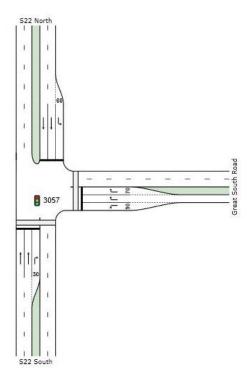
SH22 / Great South Road intersection (prior to Auranga connection, 2028)
